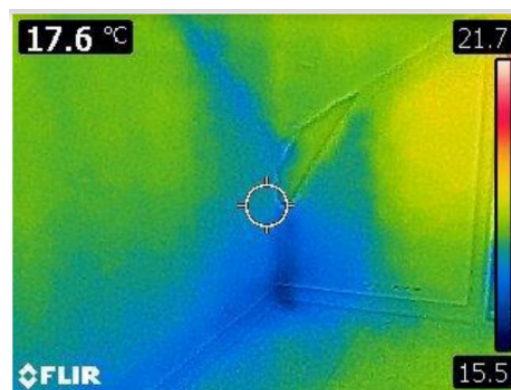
Heat loss at the junction of stud walls and floor in the 1st floor room-in roof – Image © OAMK
